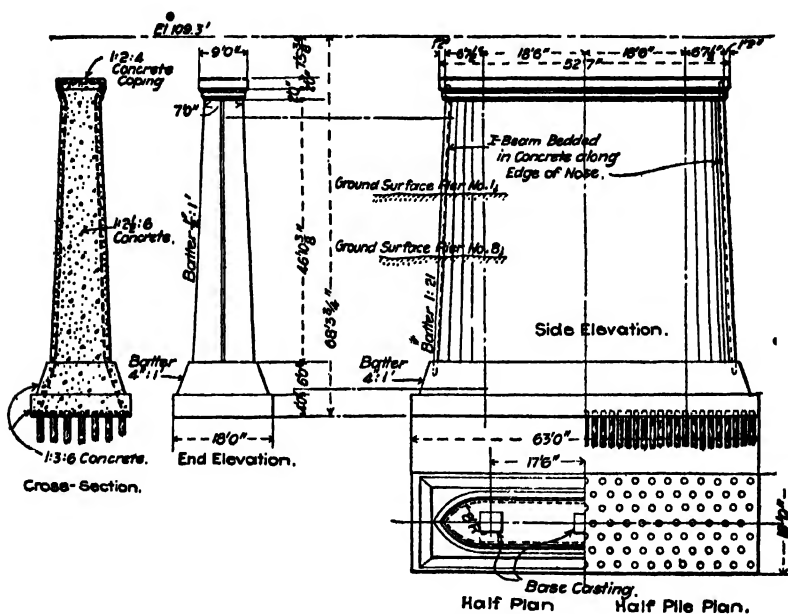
b*.—General Dimensions of Piers of Illinois Central Railroad Bridge over Tennessee River, Gilbertsville, Ky.
